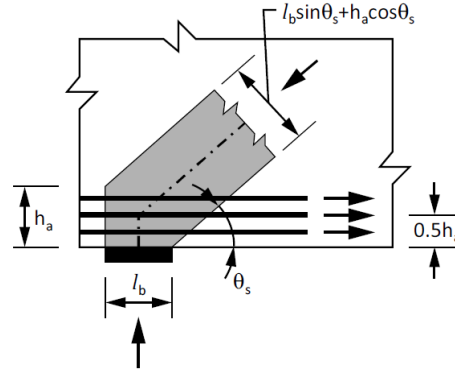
Strut anchored by bearing plate and reinforcement (Adapted from CSA, 2019)
